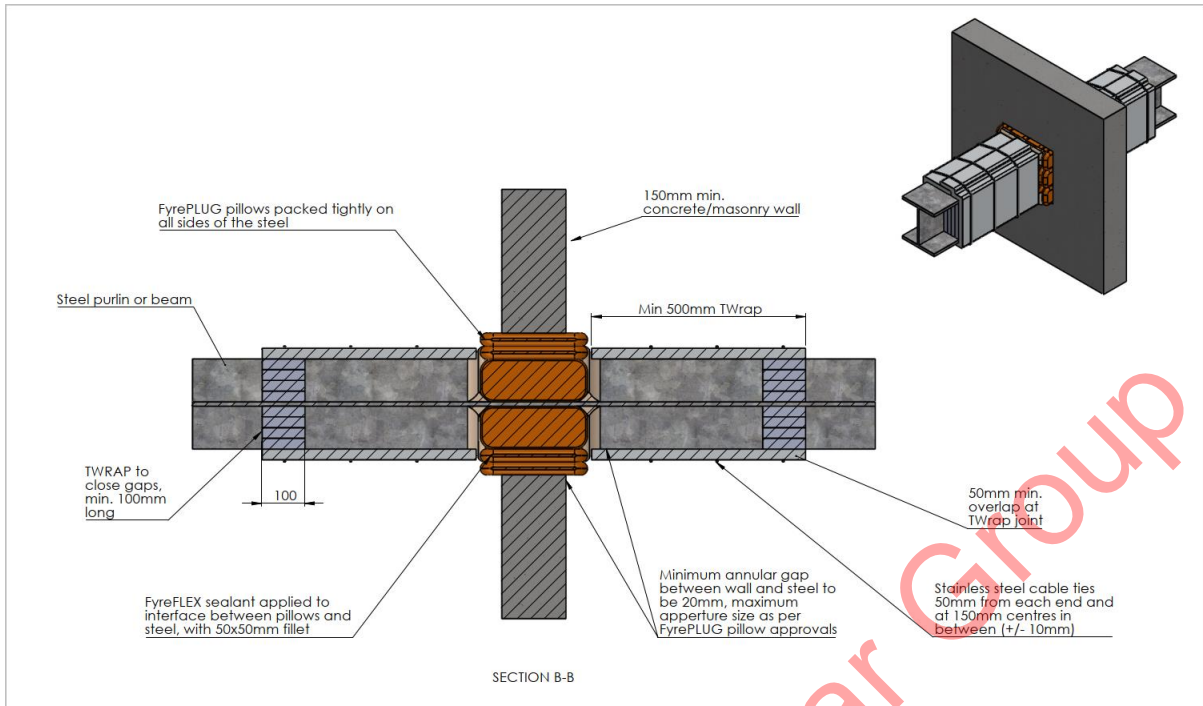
Proposed steel beam/purlin penetration system – detail 2
